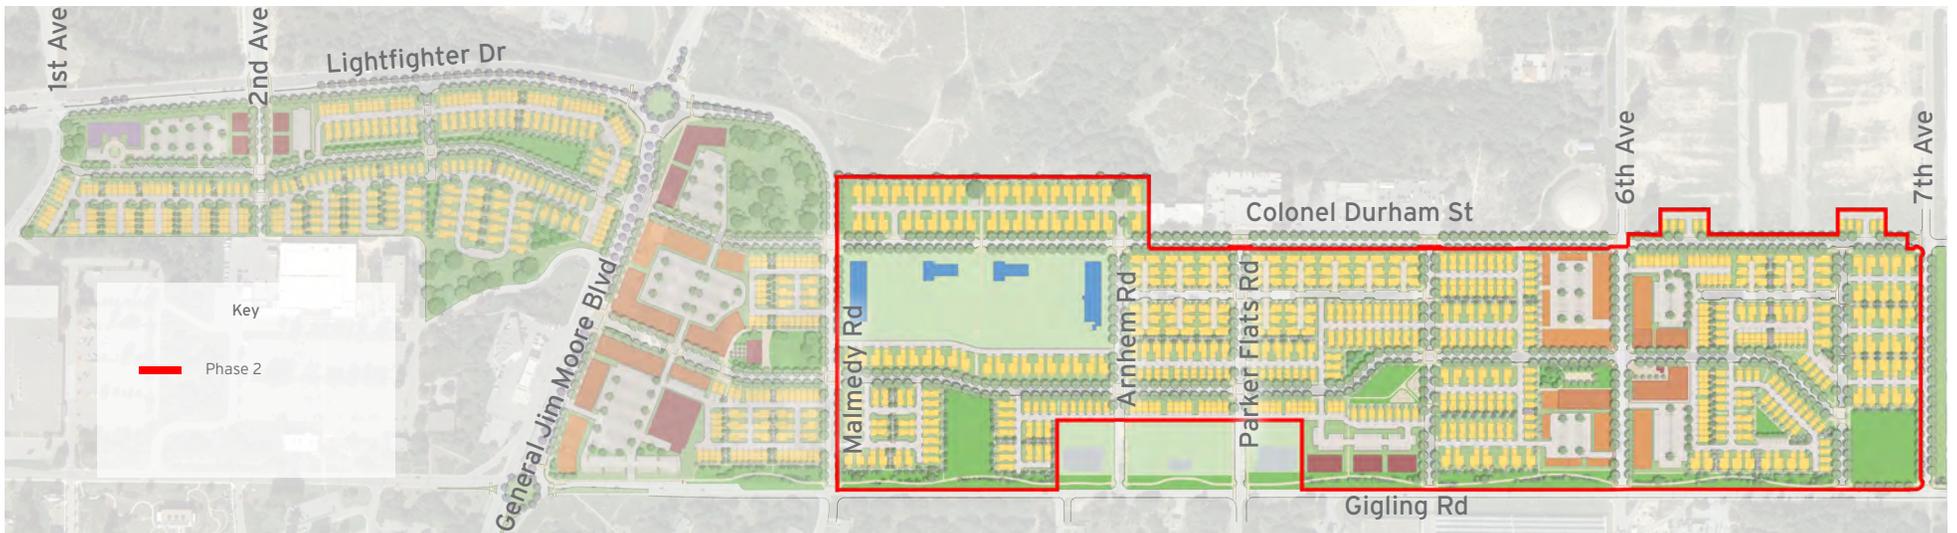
Conceptual Phase 2 Buildout Plan
